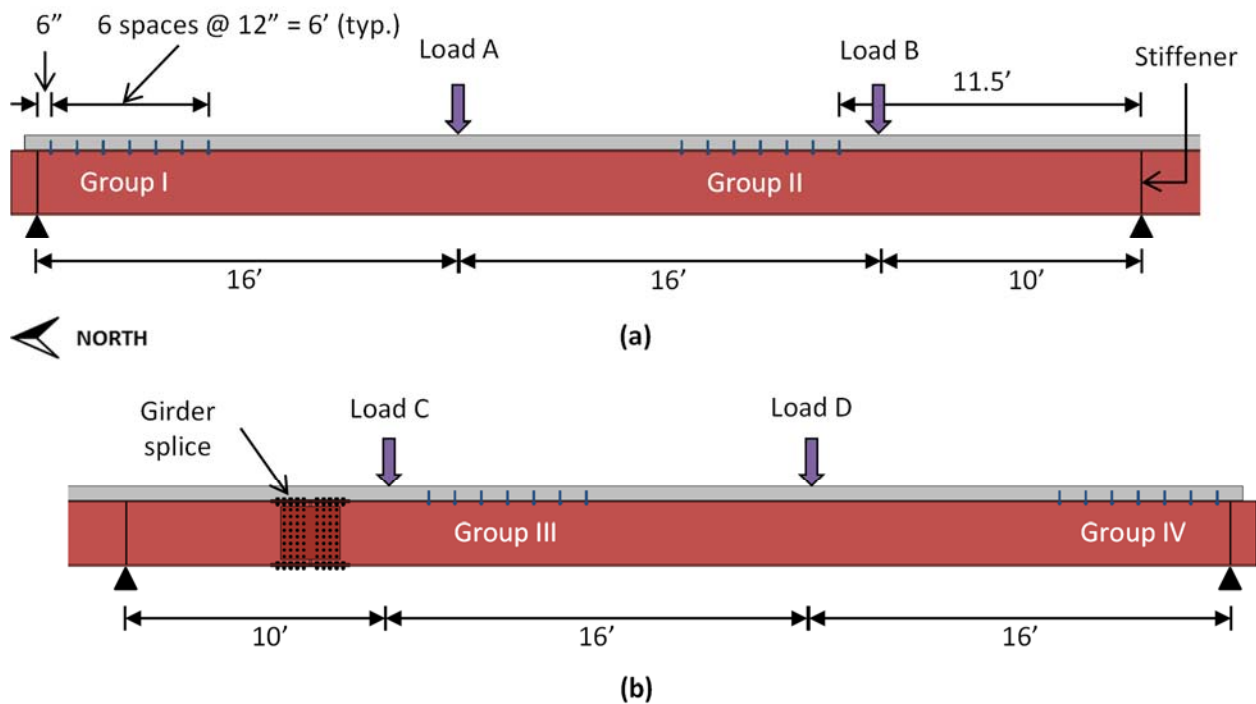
Elevation View of Test Specimen – (a) North span and (b) South span
